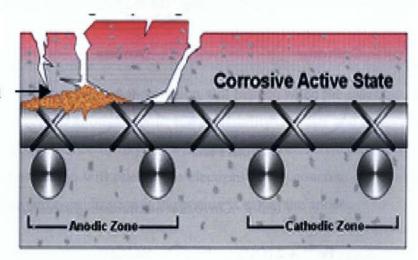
Cracks and spalling around steel rusted area
